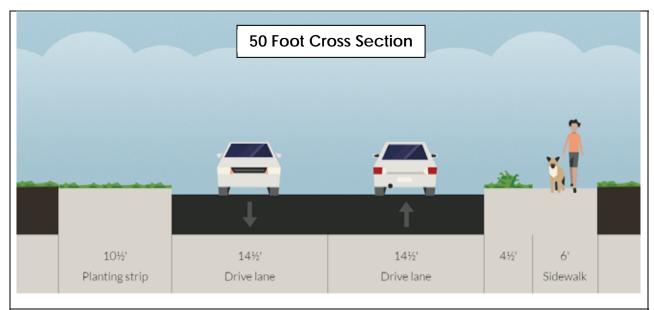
Proposed Configuration - Main Street Facing East - South Street to Town Hall
